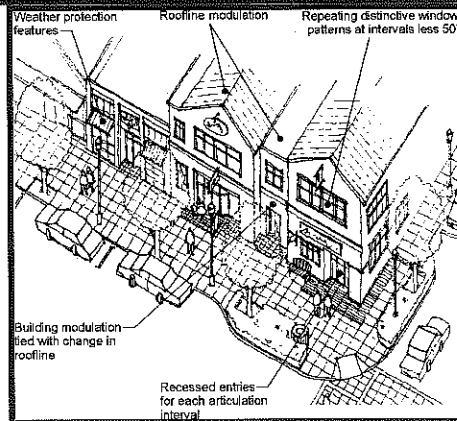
These buildings illustrate a combination of horizontal building modulation, roofline modulation, and building articulation to reduce the architectural scale and provide visual interest.
